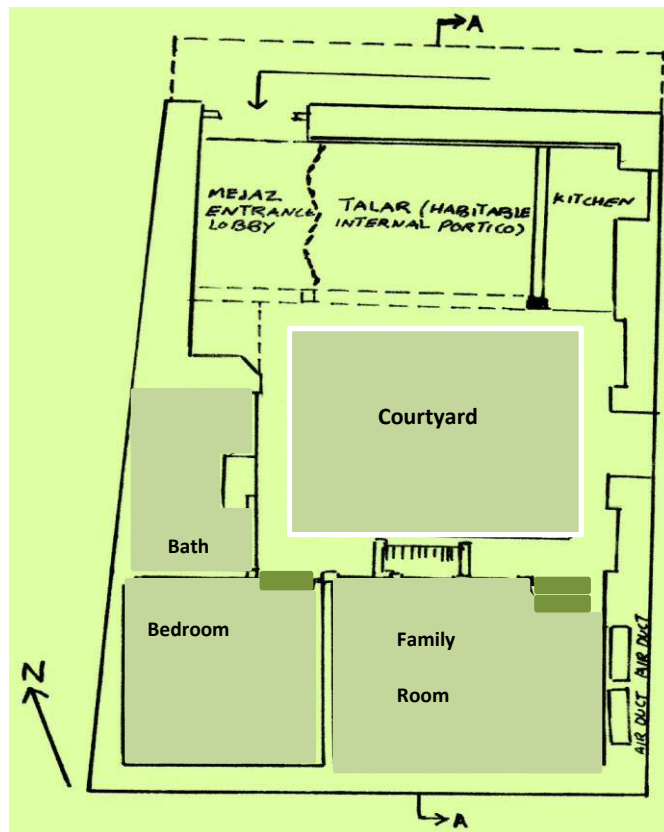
Ground floor level plan of traditional courtyard house No. 3. Scale: 1:50
